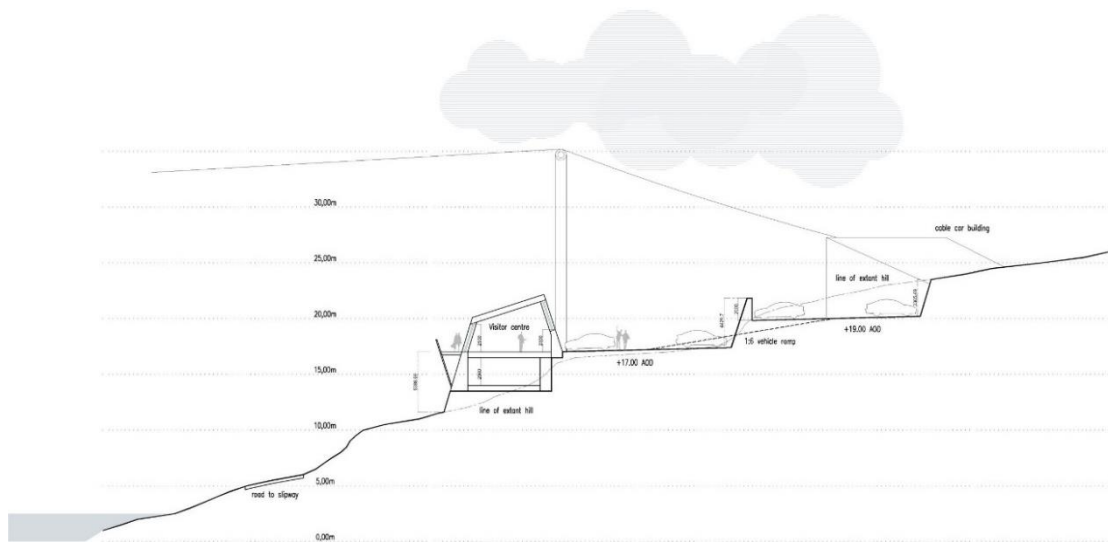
Option 3b architectural section showing the terracing of the carpark
